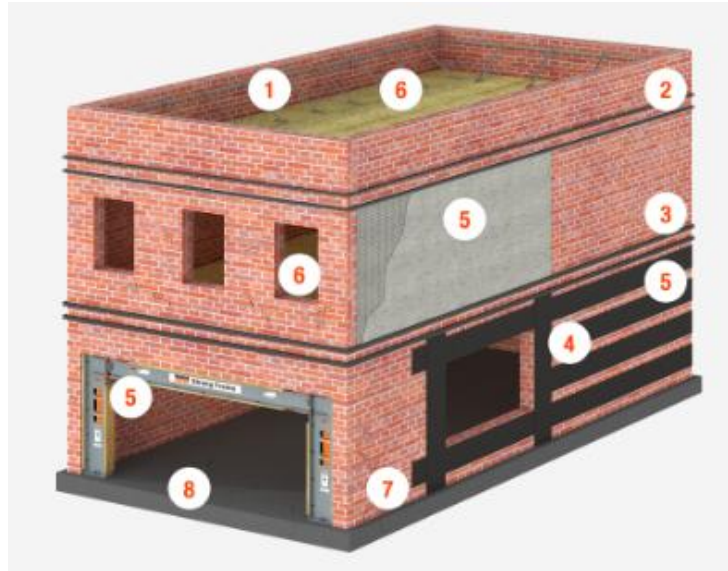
Representation of the retrofit applications for URM buildings [20]: (a) (1) parapet bracing; (2) wall-to-roof anchorage; (3) wall-to-floor anchorage; (4) out-of-plane wall bracing; (5) lateral shear resistance; (6) diaphragm strengthening; (7) veneer anchoring and stitching; (8) concrete foundation
